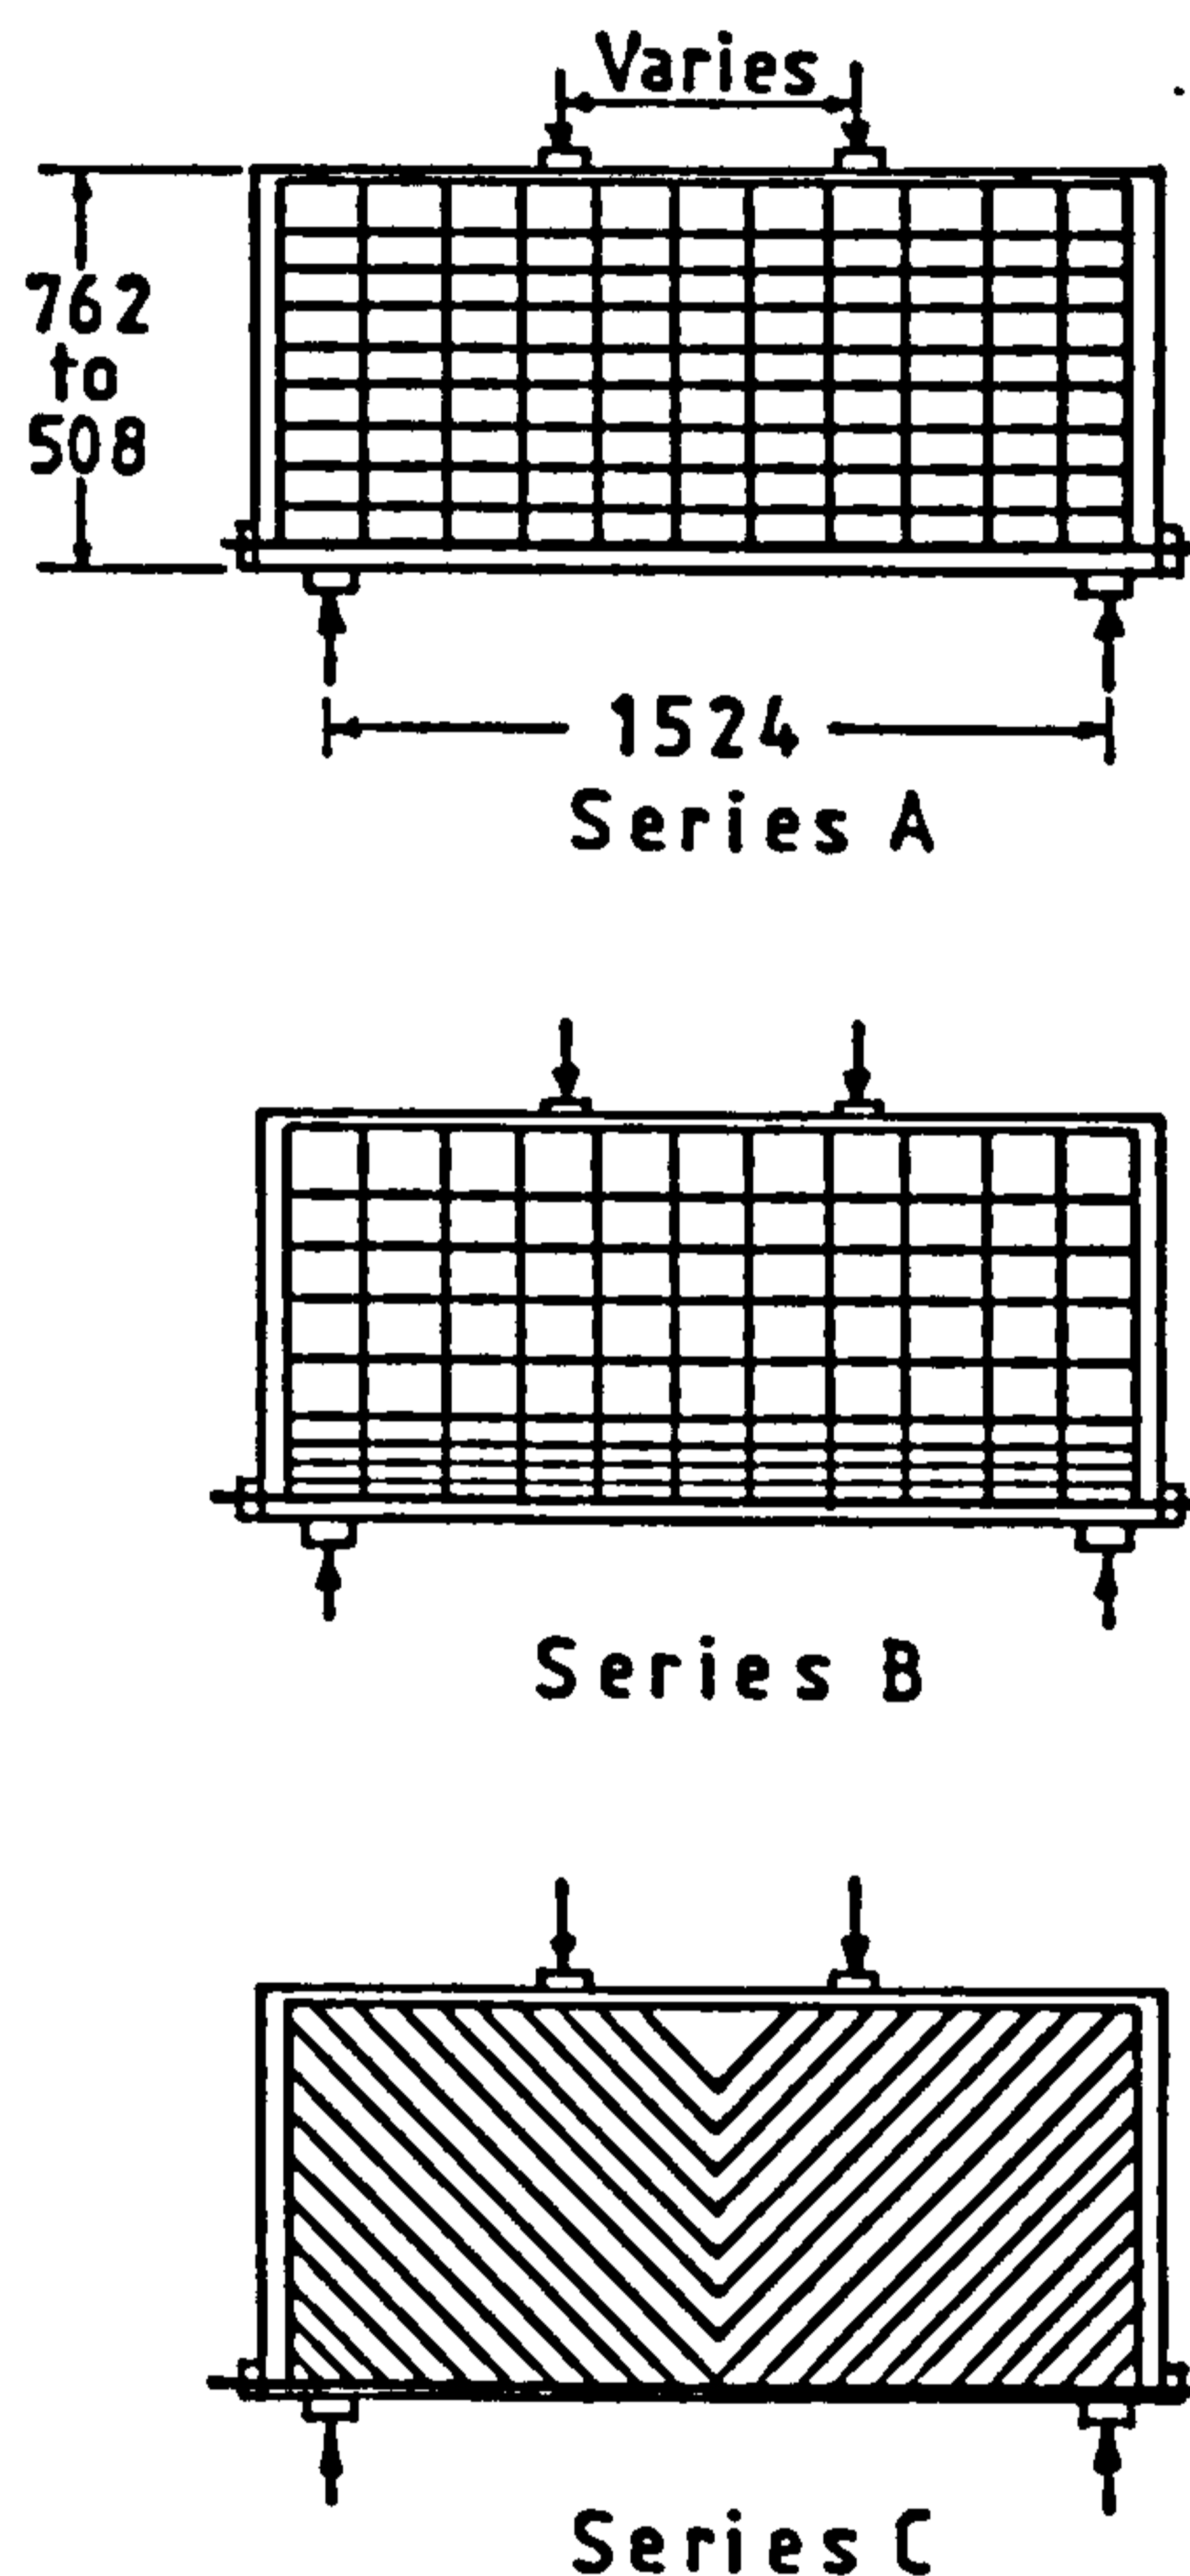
General arrangement and details of web reinforcement (Kong and Singh, 1974)
